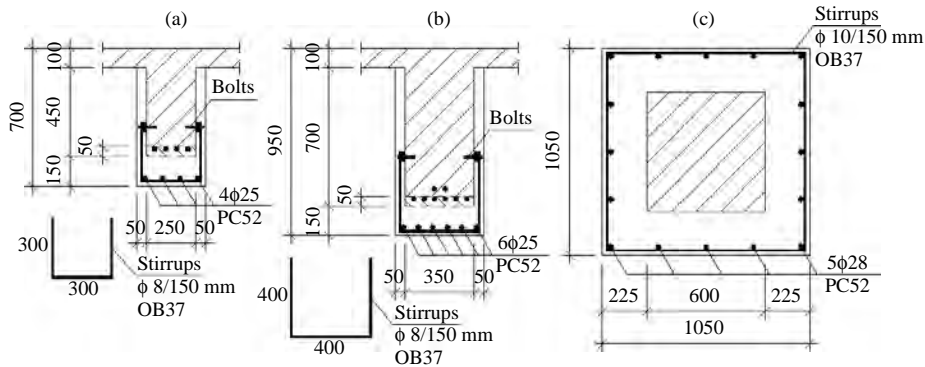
RC jacketing solutions: (a) secondary beam; (b) main girder; (c) column (Units: mm)
